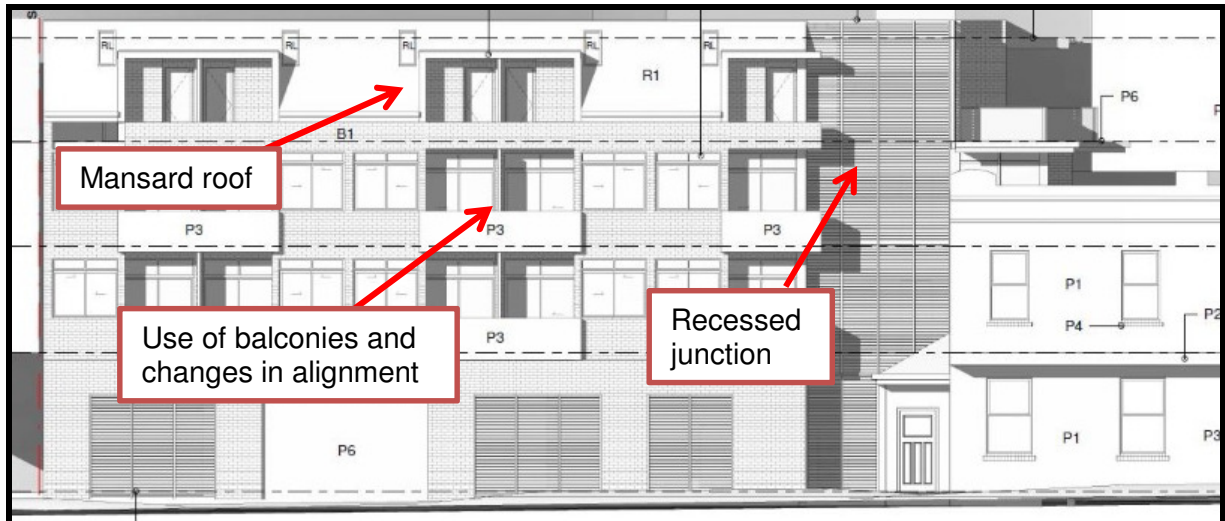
Southern elevation showing mansard roof (Source: Giles Tribe Architects)
